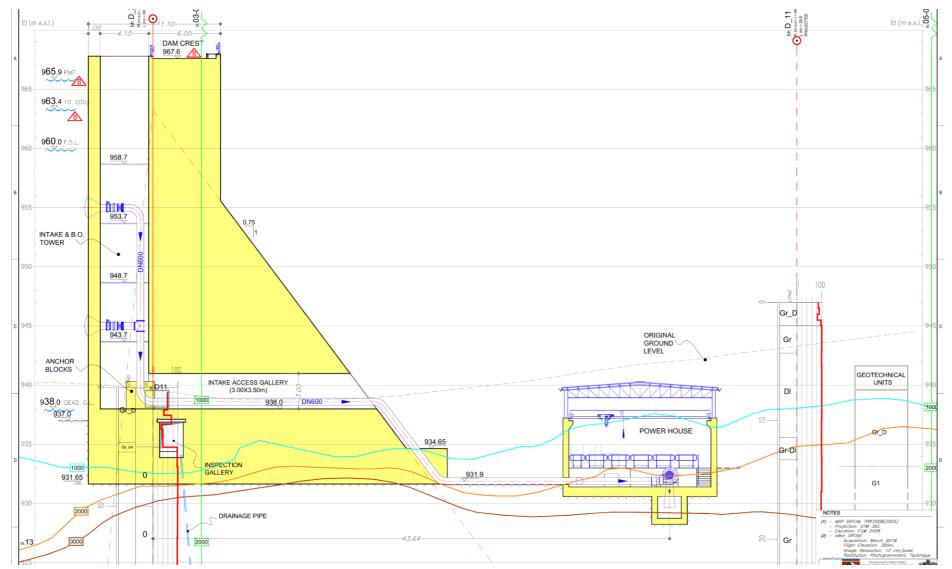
Cross-section of the Dam Intake to the Powerhouse (Studio Pietrangeli, 2019)
